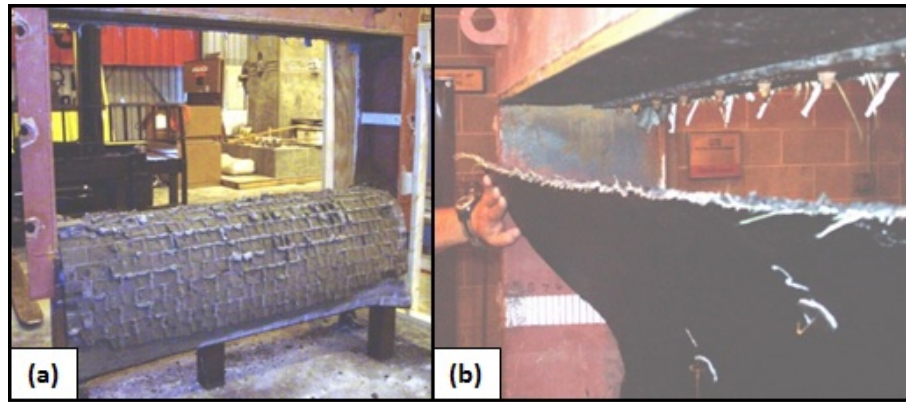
SW9. (a) Posttest photo of Wall SW9. (b) Retrofit system failed along the top support.
